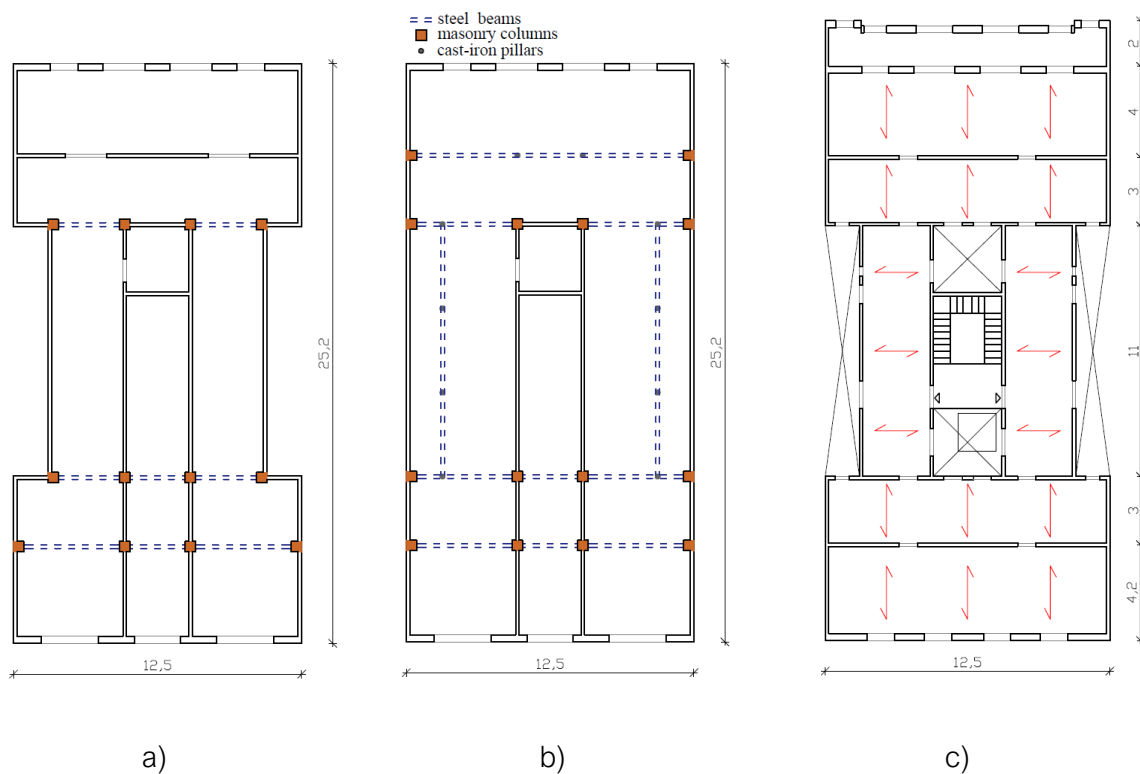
Geometrical configuration of an existing building typology in the Eixample district: a) plan of the ground floor with unreinforced masonry walls; b) plan of the ground floor of a hybrid steel-masonry system; c) typical floor plan for the rest of the storeys (dimensions in metres).
